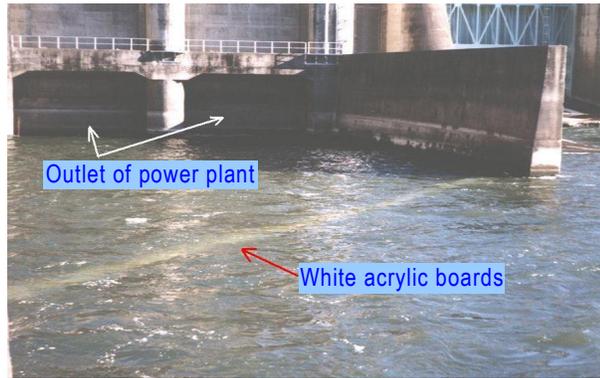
Water outlet of the power plant - fish straying prevention device - (white acrylic boards)
